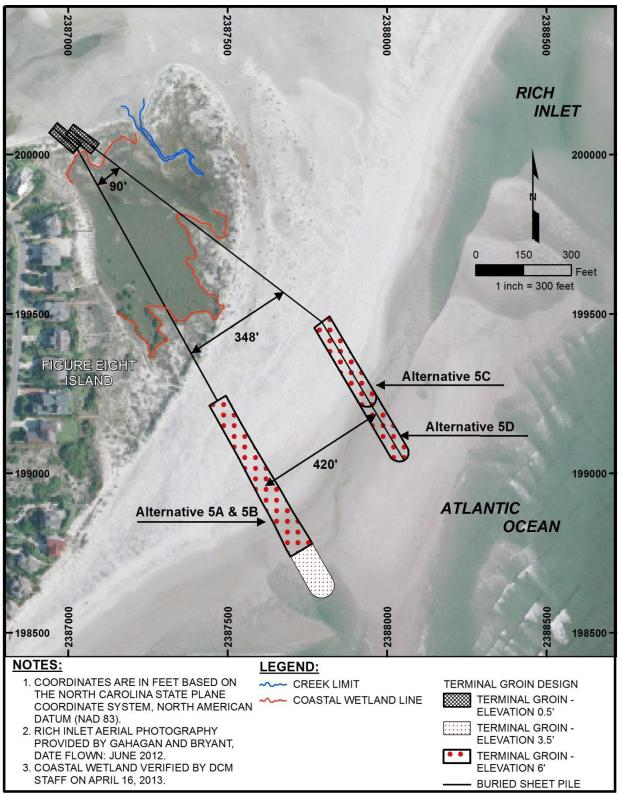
Terminal groin layout for all four (4) terminal groin alternatives on the north end of the island.
